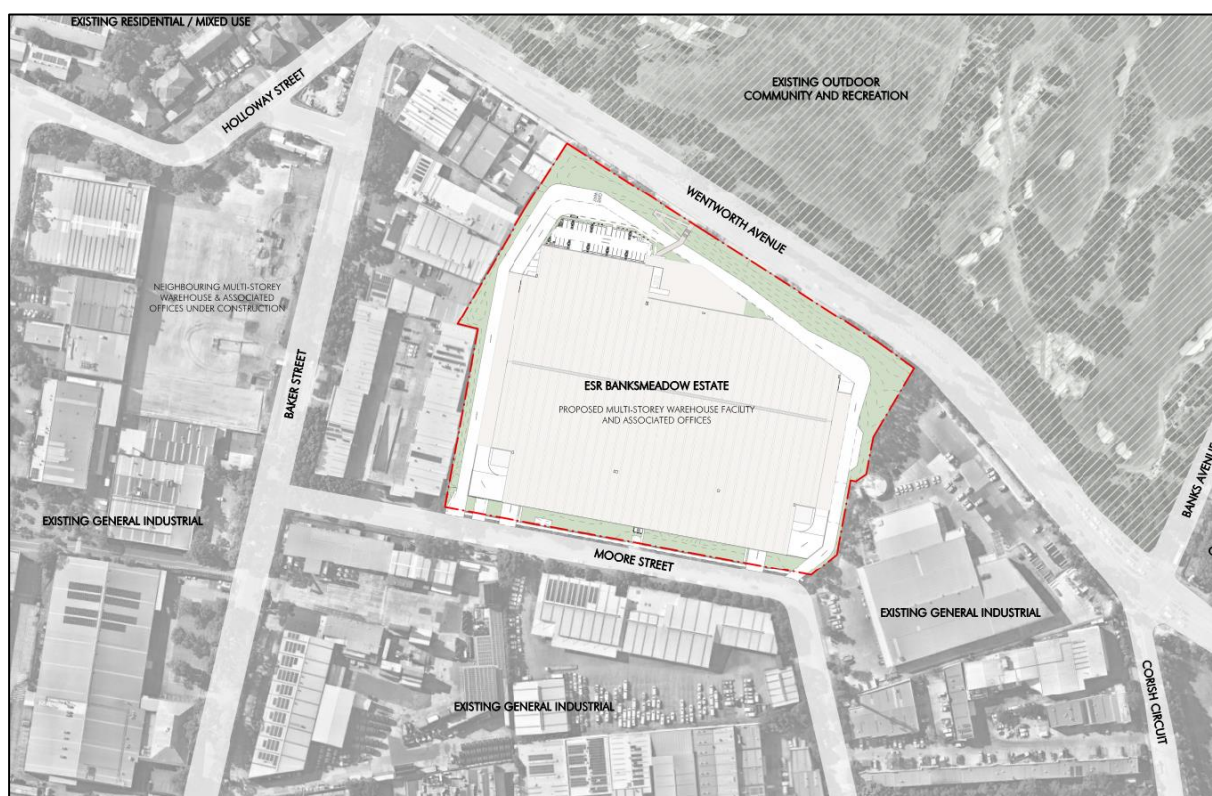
Site Plan (Nettletontribe Architects, 2024)
